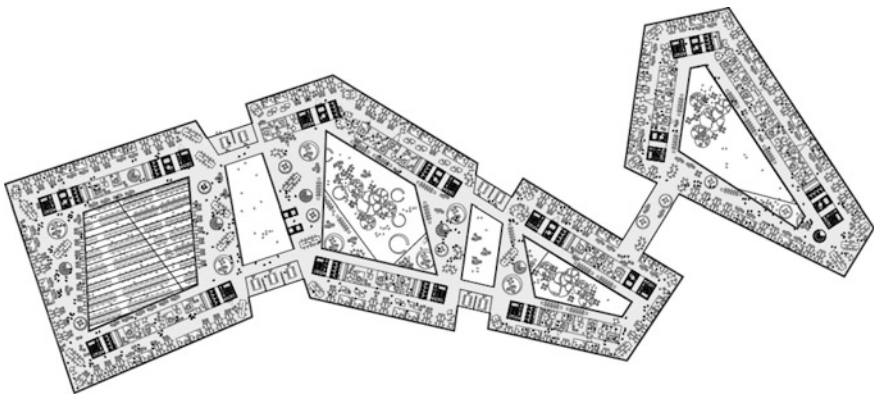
Nordea Bank Headquarters typical *upper* level floor plan. *Image credit* Henning Larsen Architects
